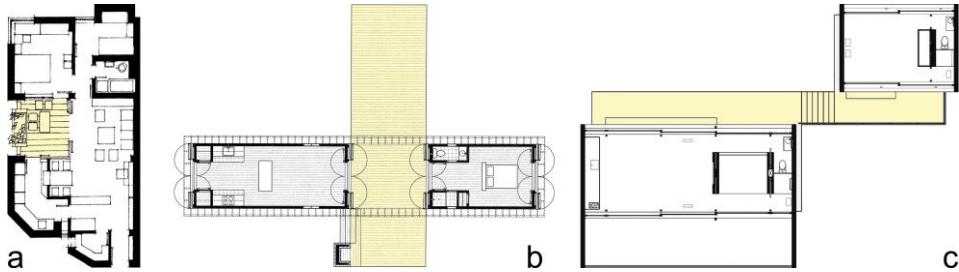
Motive of external “transient” space: a) Housing Tower Y, Kragujevac, Dragoljub Bakić, 1978; b) Zachary House, Louisiana, Stephen Atkinson, 2012; c) Wee House, Santa Rosa, Alchemy, 2016 (Source: author’s private collection)
